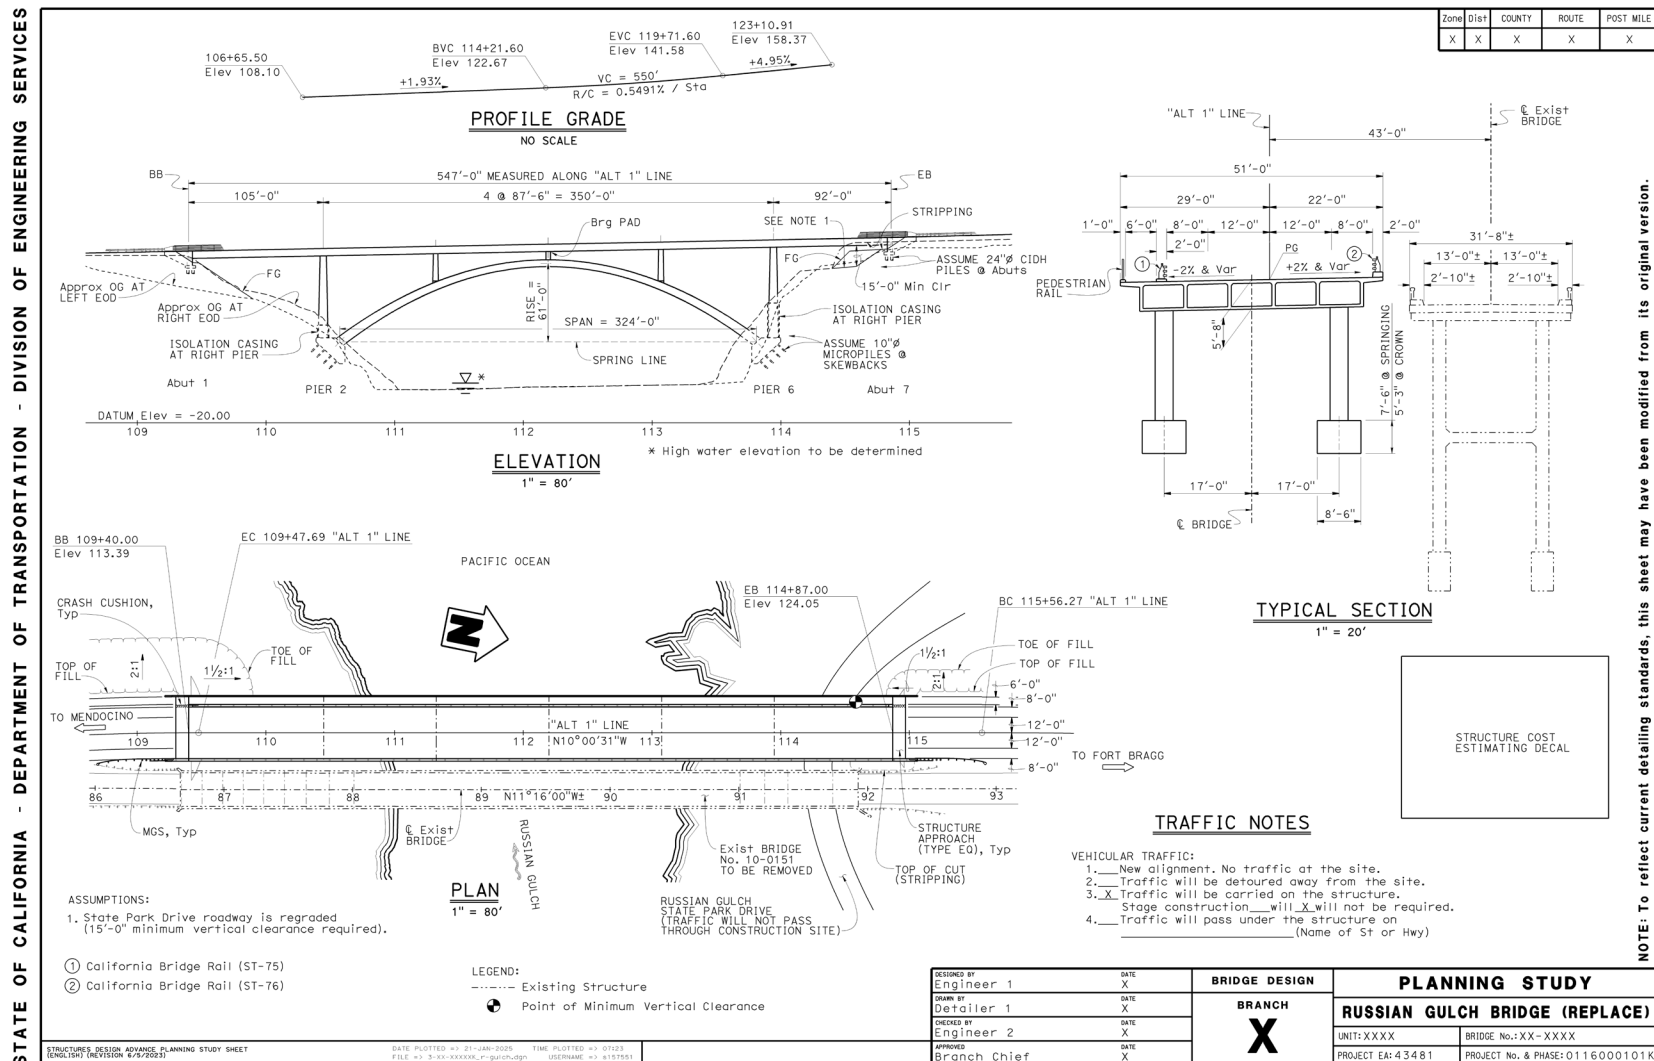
A.B.4 Advance Planning Study Detailing Example 4
